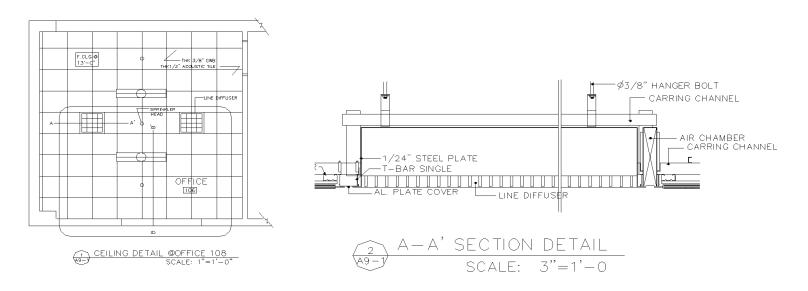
Detail drawings with an enlarged plan drawing of part of the ceiling
